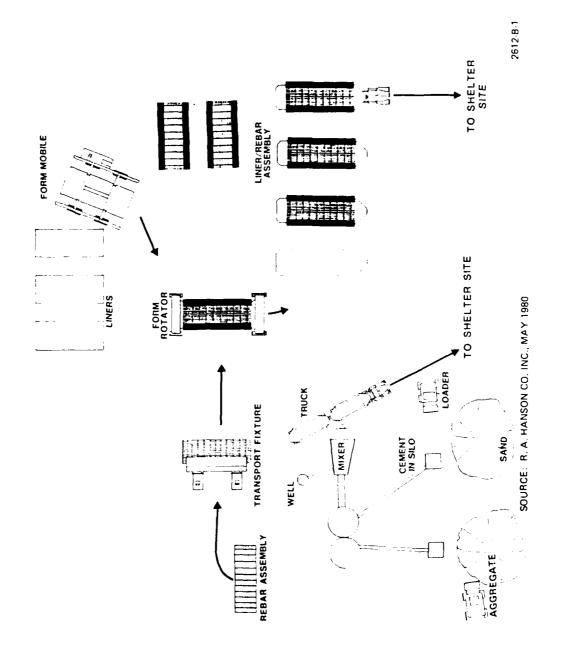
Mechanized cast-in-place concrete plant.
